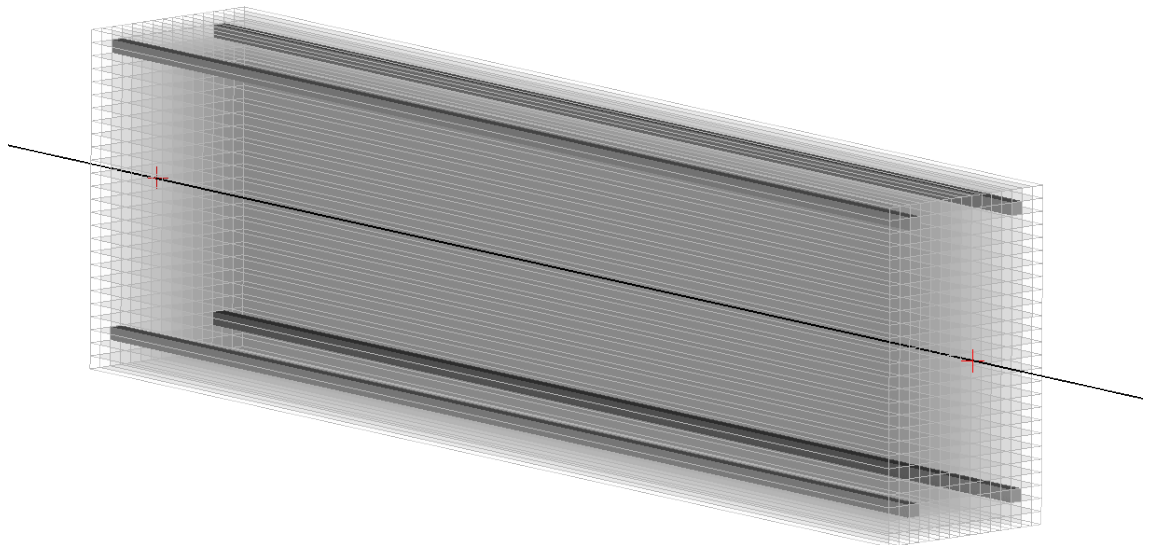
b : Modeling of a beam reinforced concrete by a multifibre beam.
